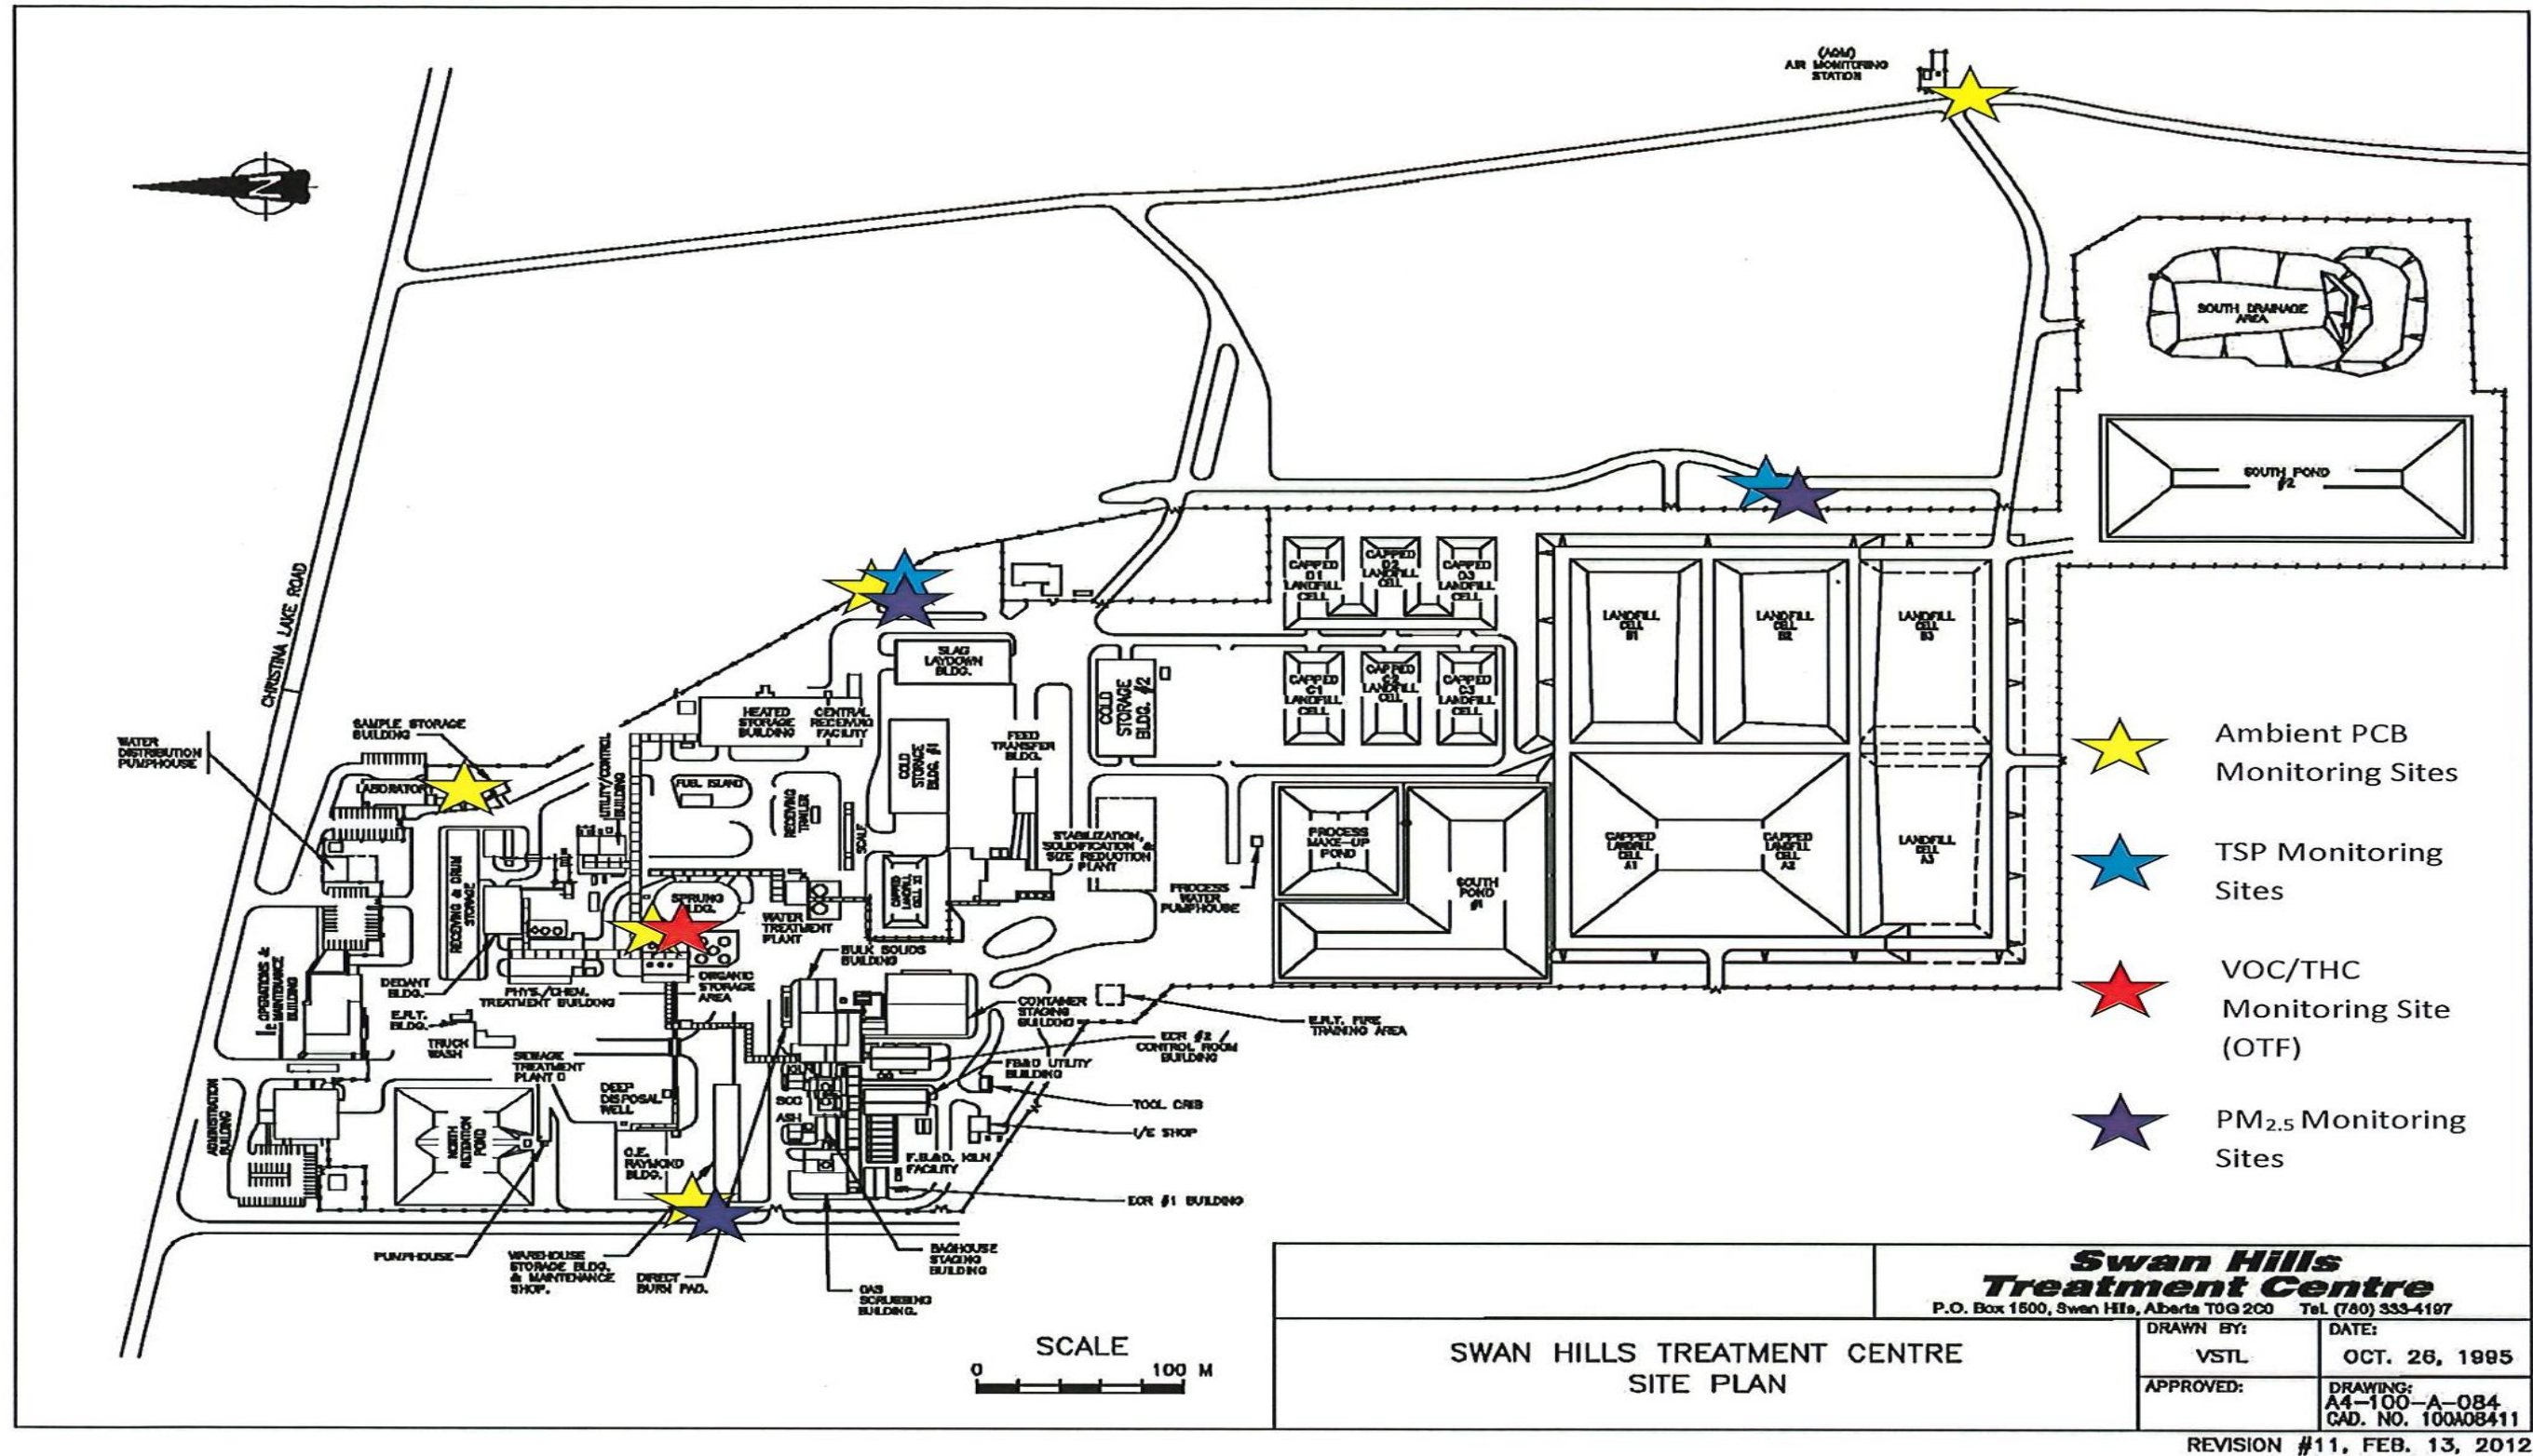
SHTC Site Plan Locations of Air Monitoring Stations
